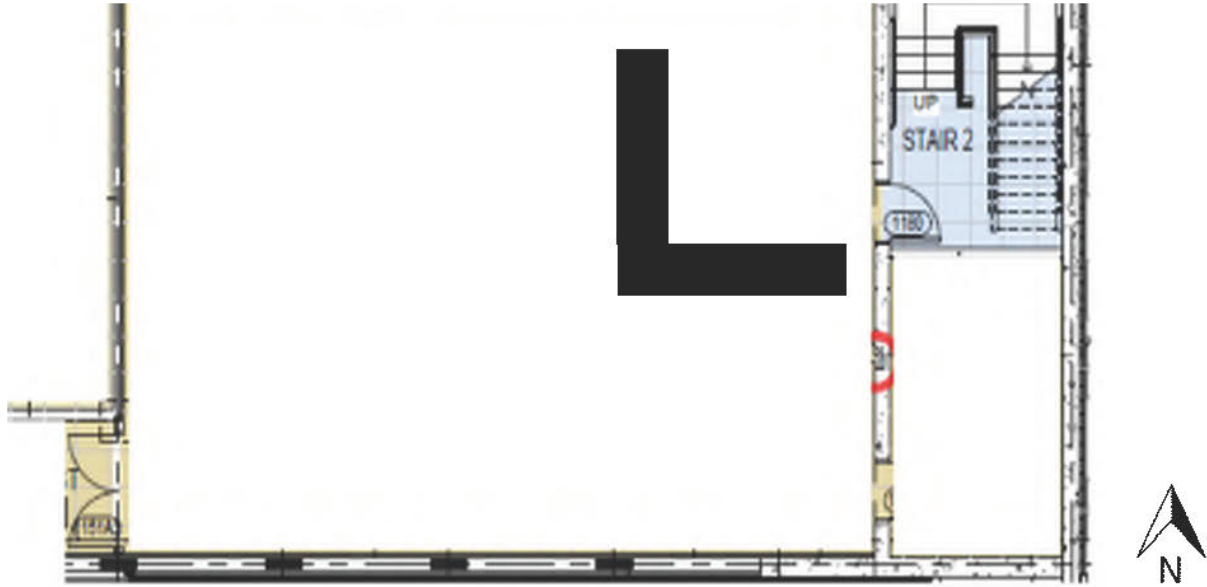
LW-B permutation at BC Hydro Theatre (18 living wall panels mounted on 2-3X3 steel frames) (Drawing retrieved from Busby Perkins + Will Architectural drawings, 2009).
